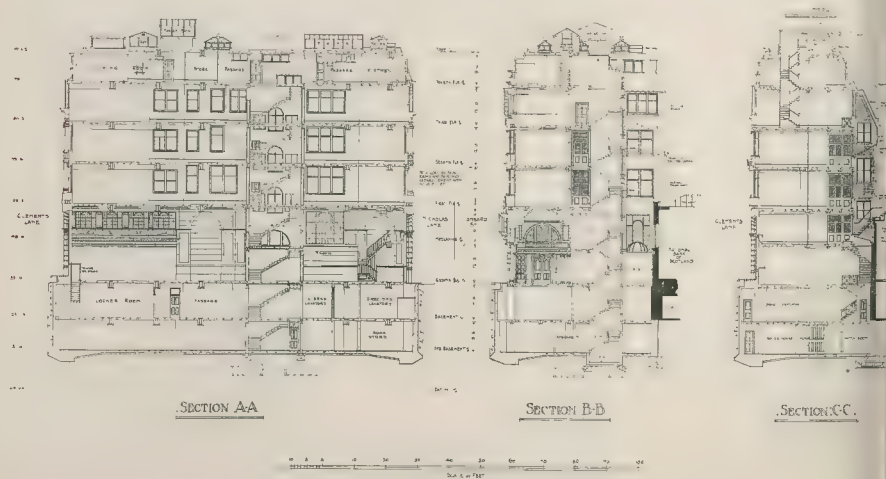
Royal Insurance Building: Longitudinal and Cross Sections.
